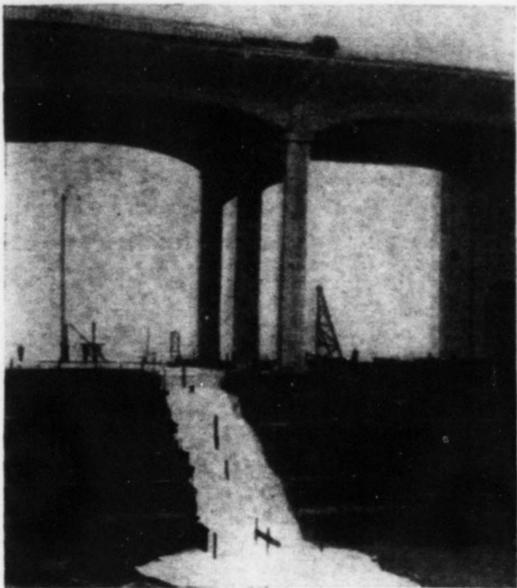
Fill for the future railroad level under the south approach was placed hydraulically behind timber bulkheads.
